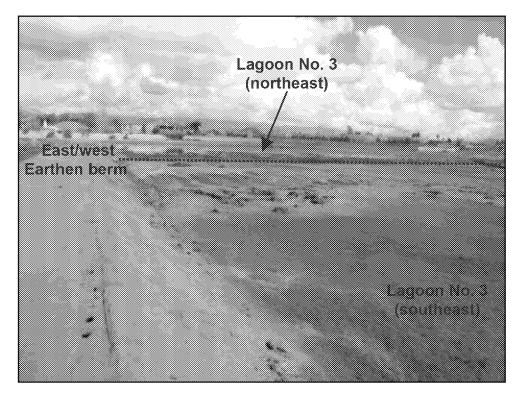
View facing northeast from the southwest corner of the southeast portion of lagoon No. 3.
